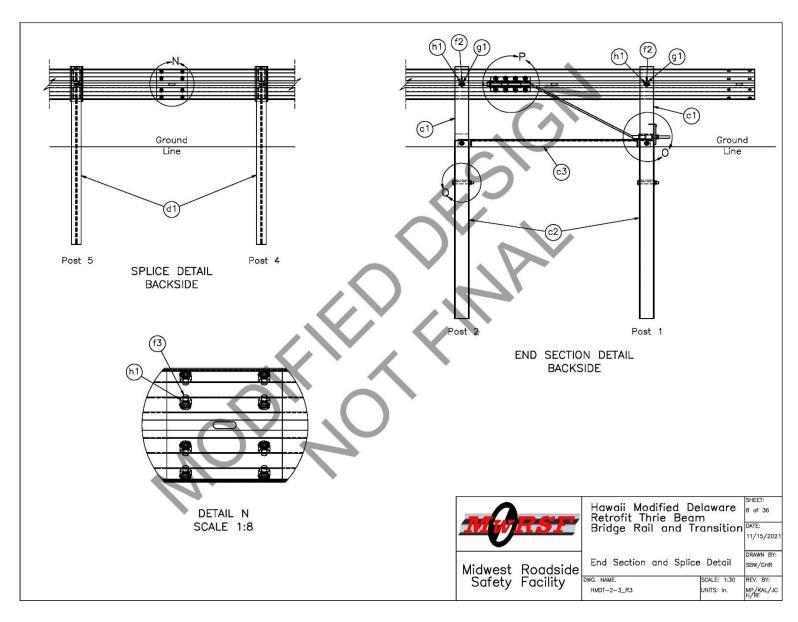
End Section and Splice Detail, Test Nos. HMDT-2 and HMDT-3
